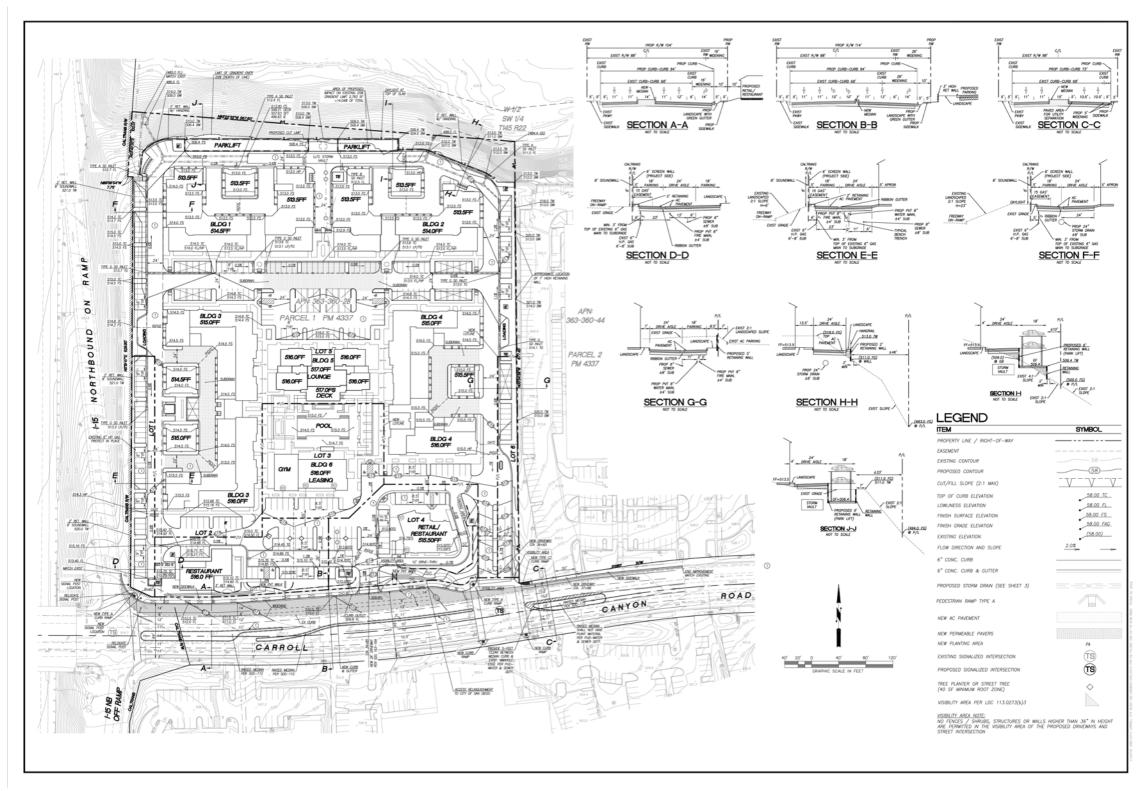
Carroll Canyon Mixed-Use Project Grading Plan
